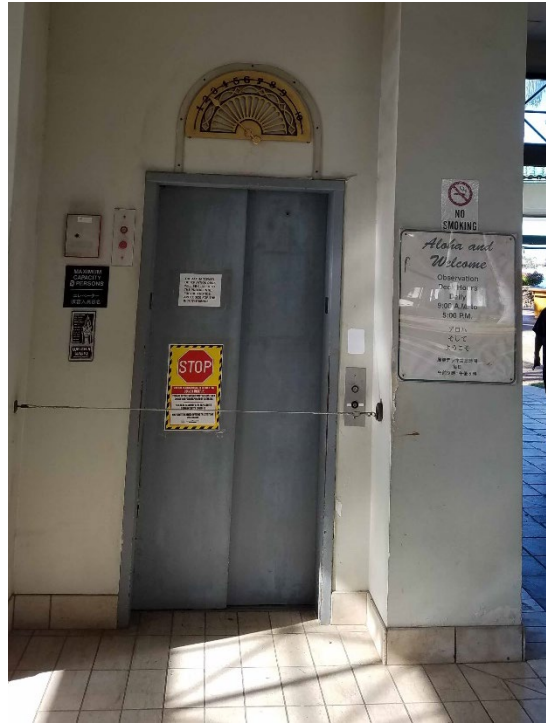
Existing ground floor call station. Photo 10: Existing ground floor doors.
